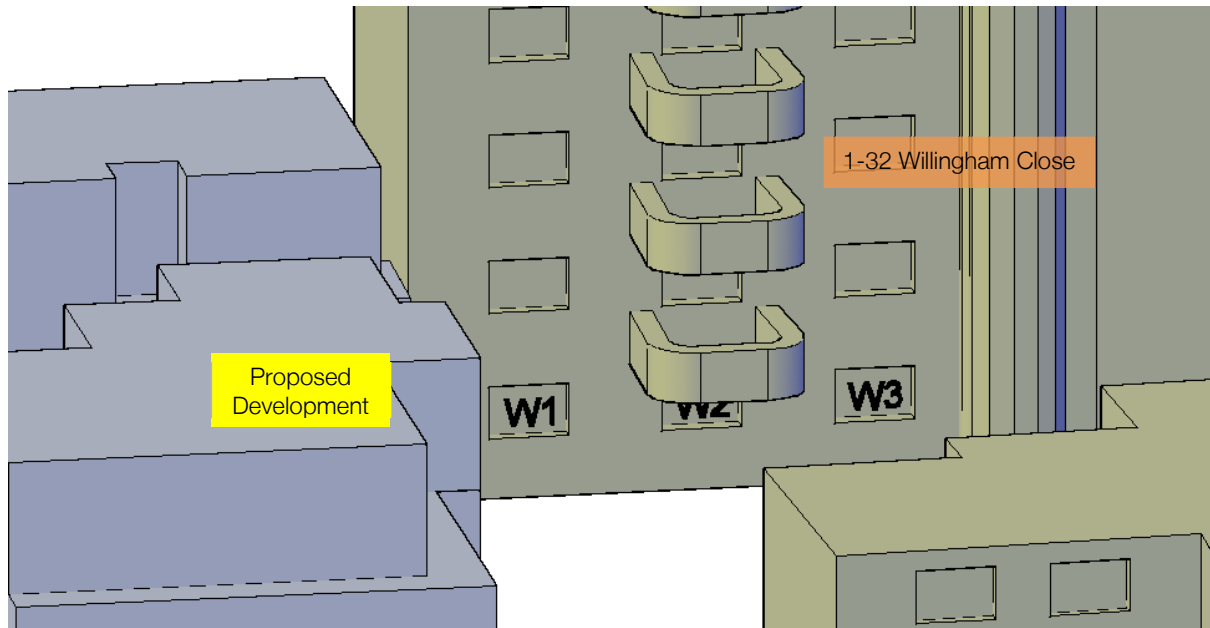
Windows assessed for daylight – 1-32 Willingham Terrace
